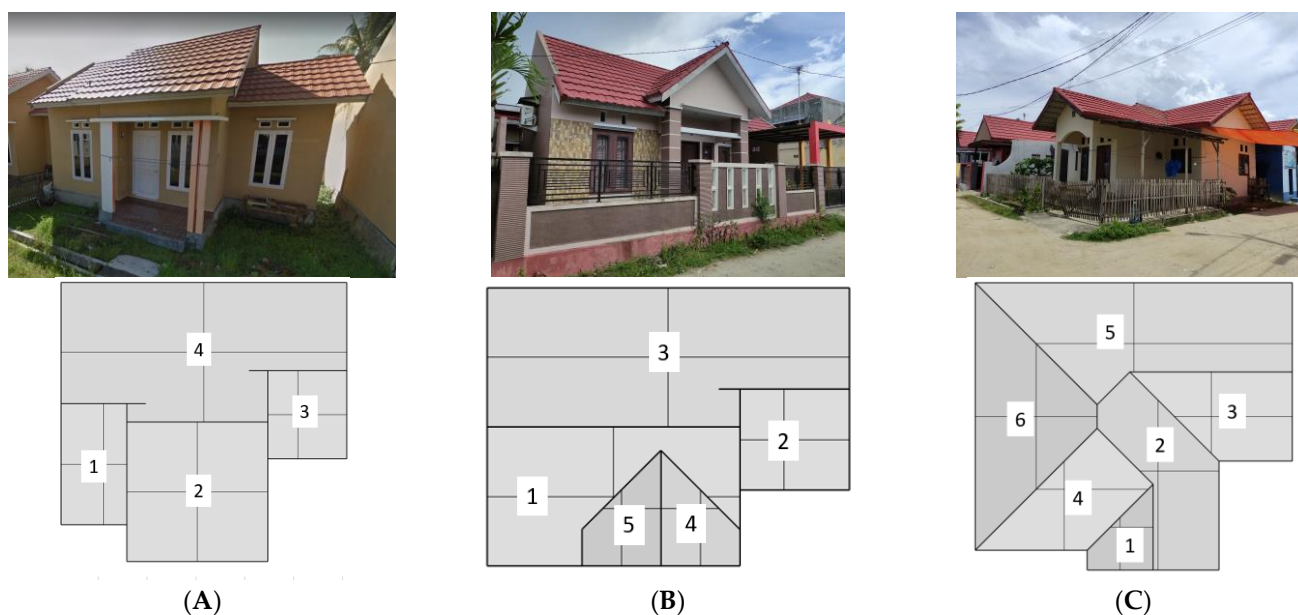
Housing found in Gorontalo city, and the roof plan. Roof (A) is stacked gable roof, (B) is complex gable roof, and (C) is complex hip roof.
